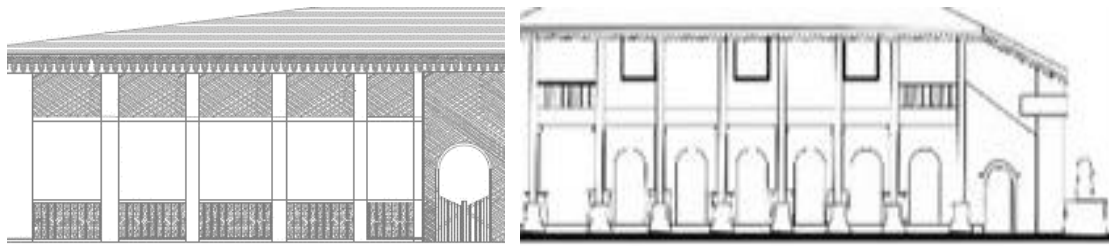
Range of recessed but columnar facades under the peristyle typology : The reconstructed Damnah façade showing plaster like columns with wall panels inserted or the peristyle forms of Inderagiri Palace façade with walls recessed from the column line
